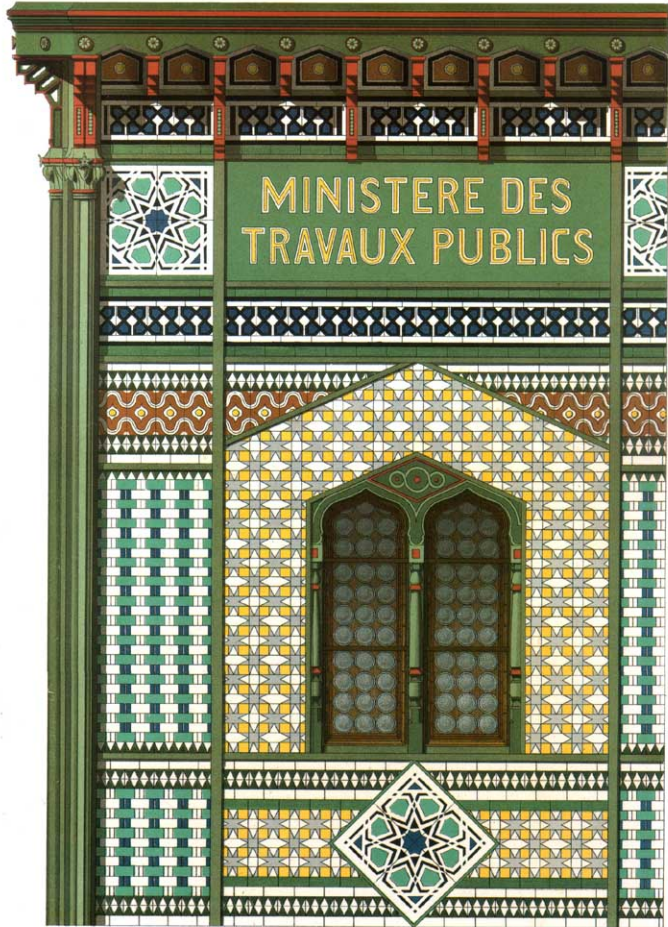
Ministry of Works building, 1878 Paris fair (also Philadelphia, 1876); architect: de Dartein.
